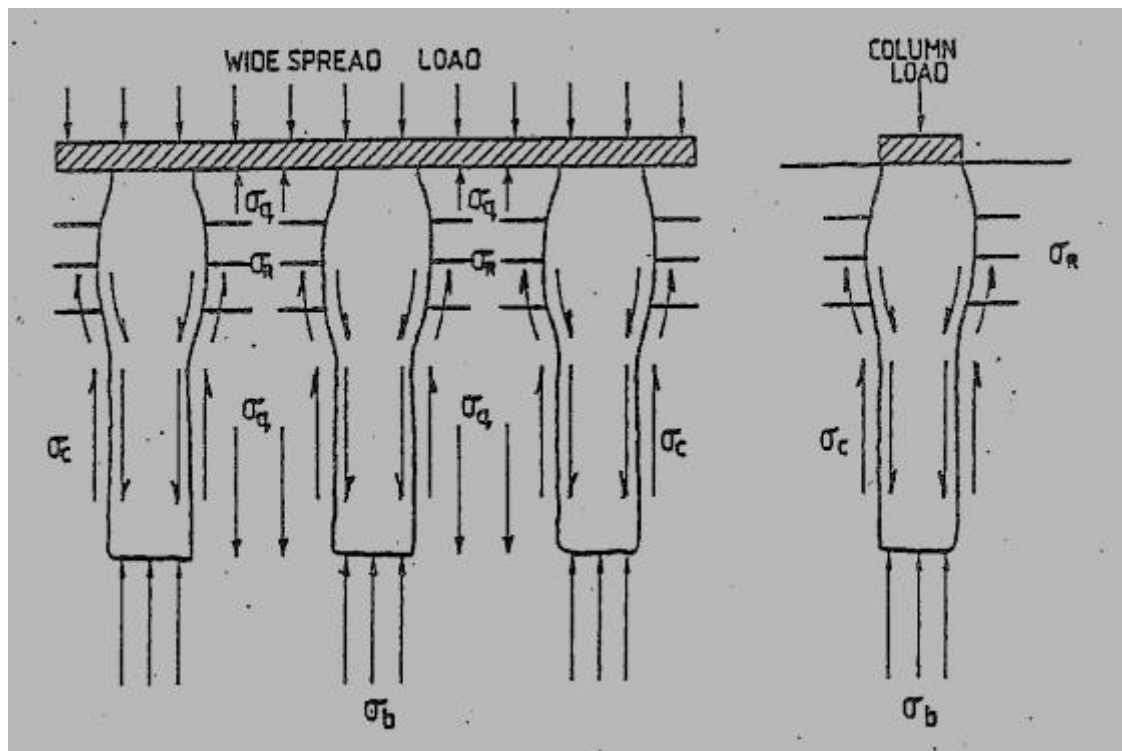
(a) Stresses associated with a stone column under an isolated footing and stone columns under a widespread load (after Greenwood, 1991). ( $\sigma_r$  = radial soil stress ).
